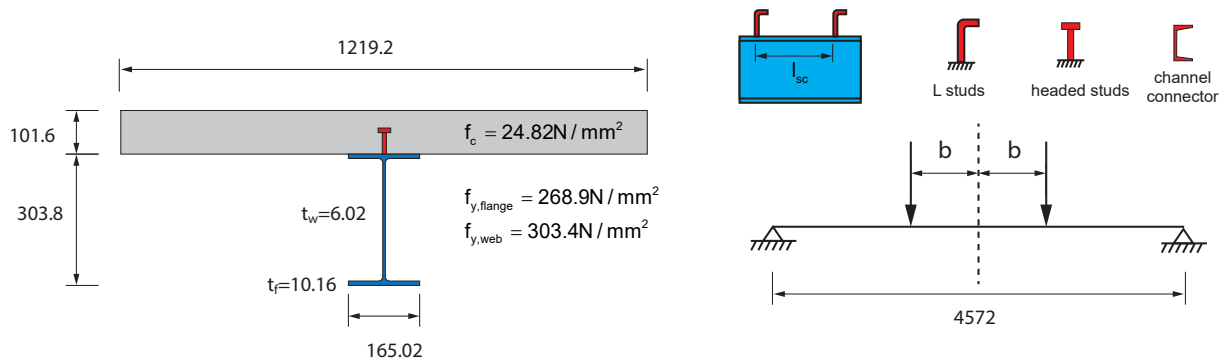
Cross-section of the calculated beam "B6S1" (details see section 5.1.1)
